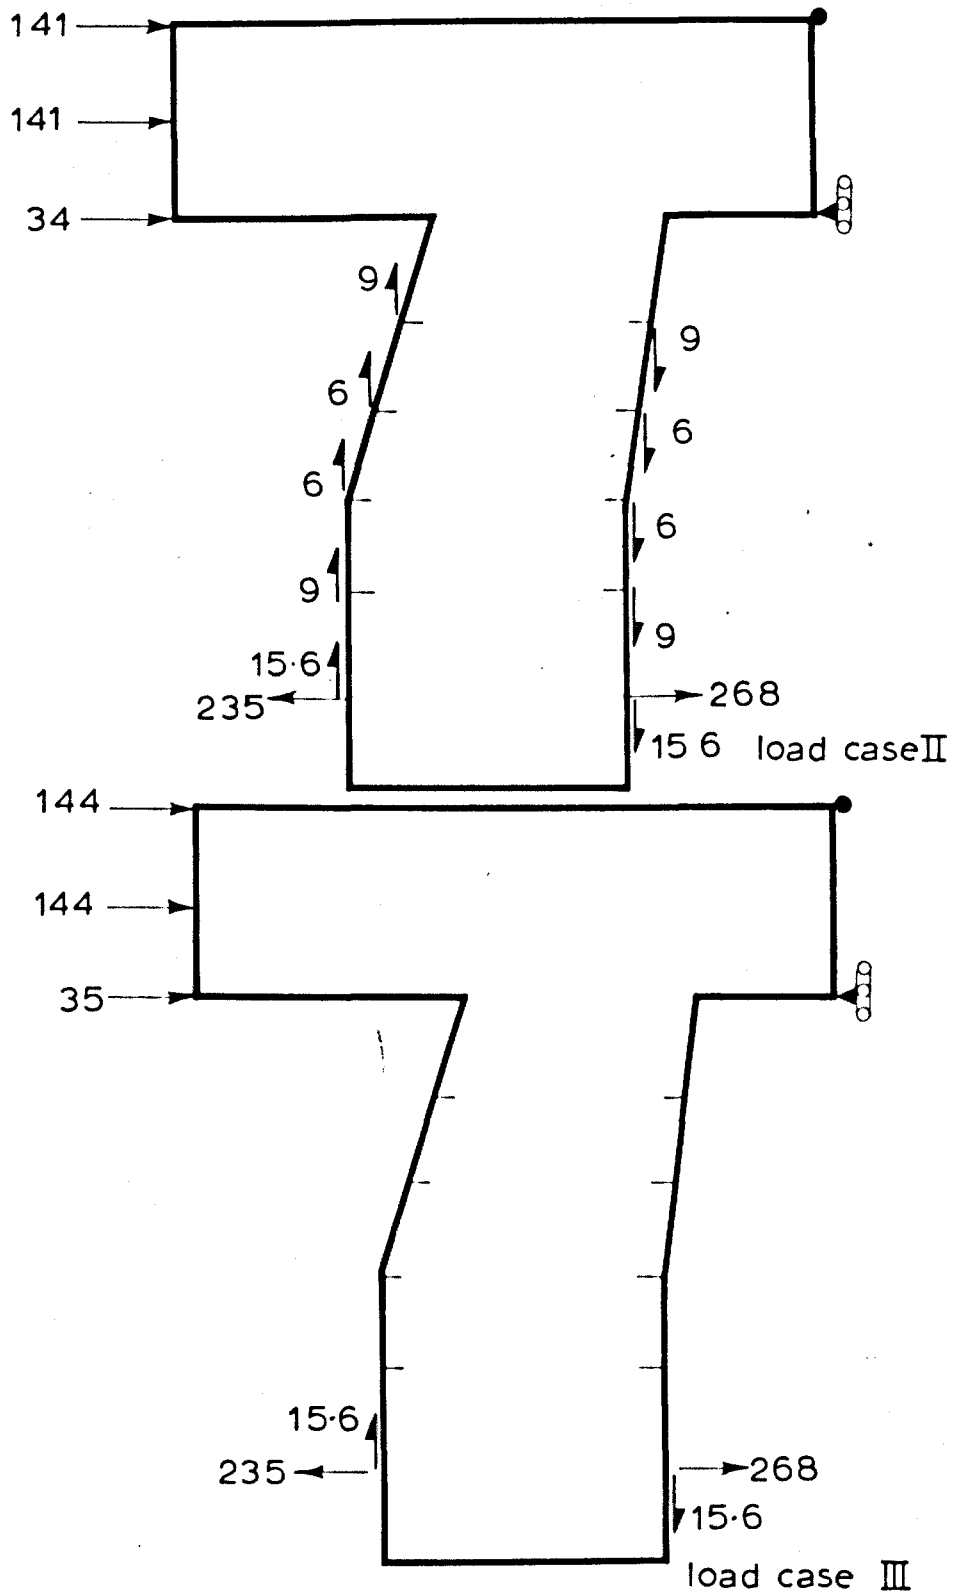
LAYOUT OF FINITE ELEMENT GRID, BOUNDARY CONDITIONS AND LOADING OF SINGLE CANTILEVER
